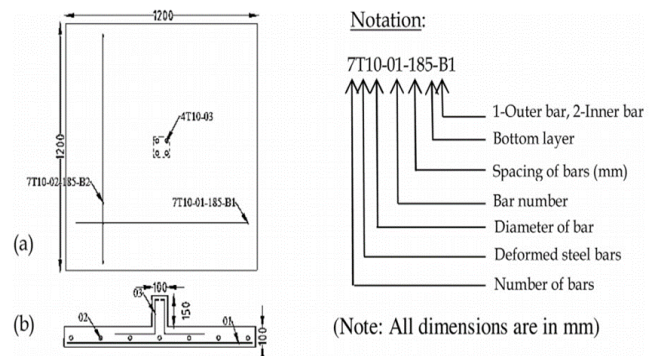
Reinforcement Details, (a) Plan, (b) Sectional elevation
